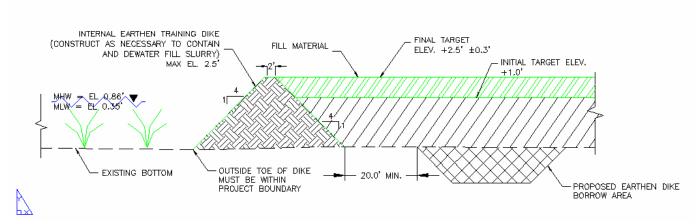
Typical Cross Section of Internal Earthen Training Dikes
